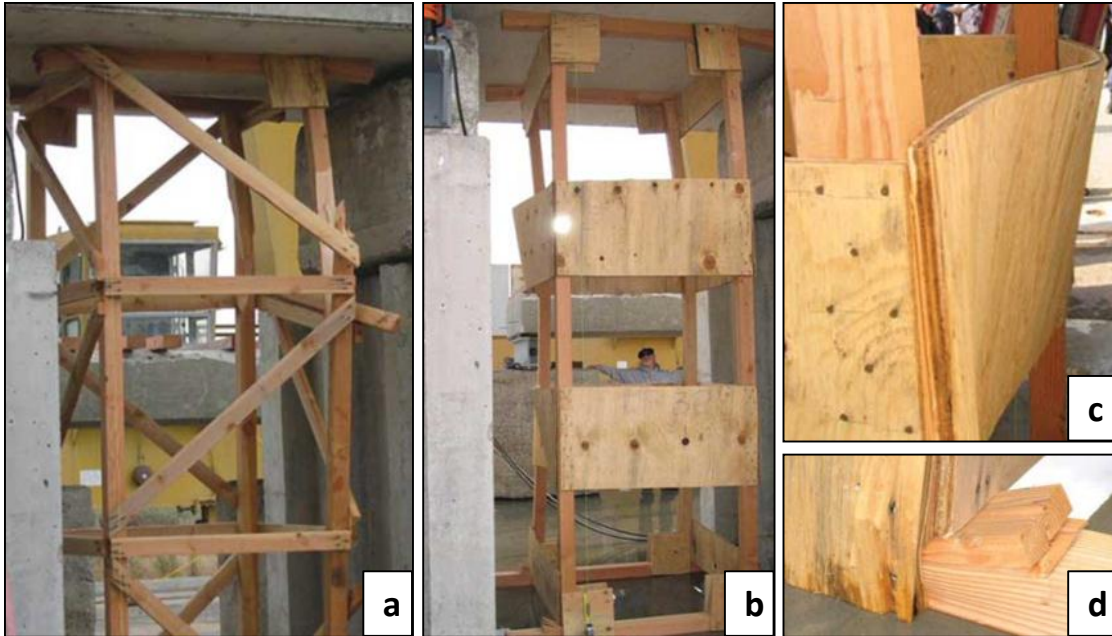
(a) LP shore failure (b) PLP shore failure at posts (c) Plywood brace warping in PLP shore (d) Typical wedge cupping at base of shores
